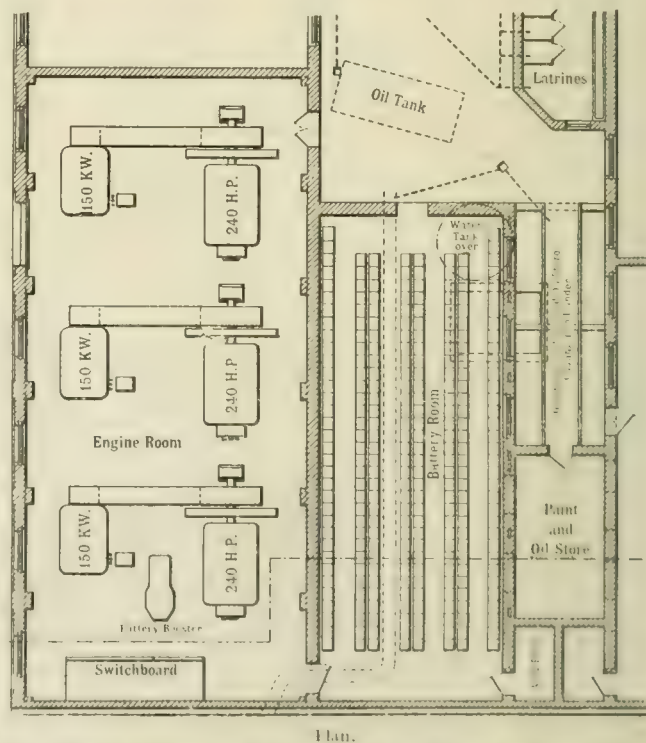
GENERAL ARRANGEMENT OF POWER STATION.
